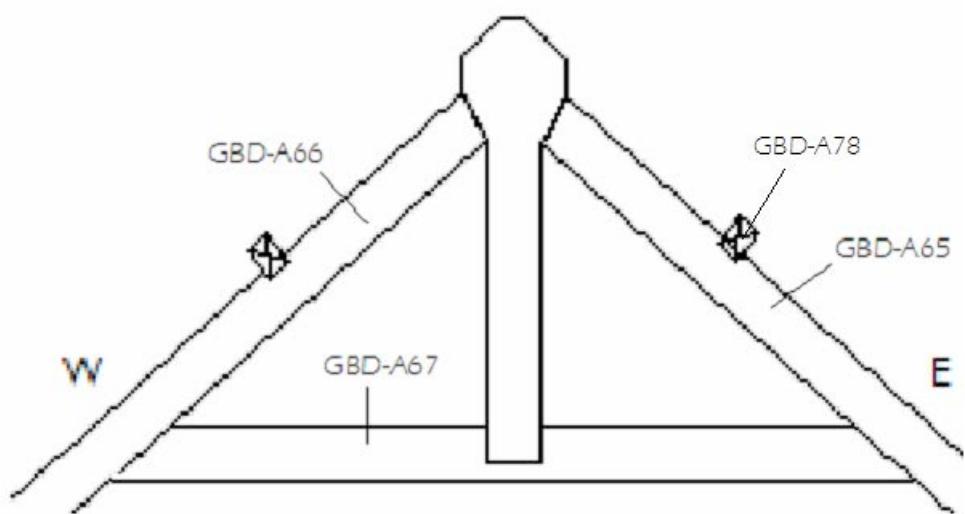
West range; sketch of truss 4, showing the location of samples GBD-A65–7
